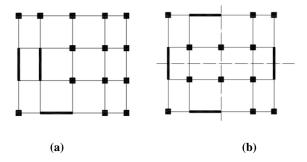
Unsymmetrical and Symmetrical placing of shear wall
